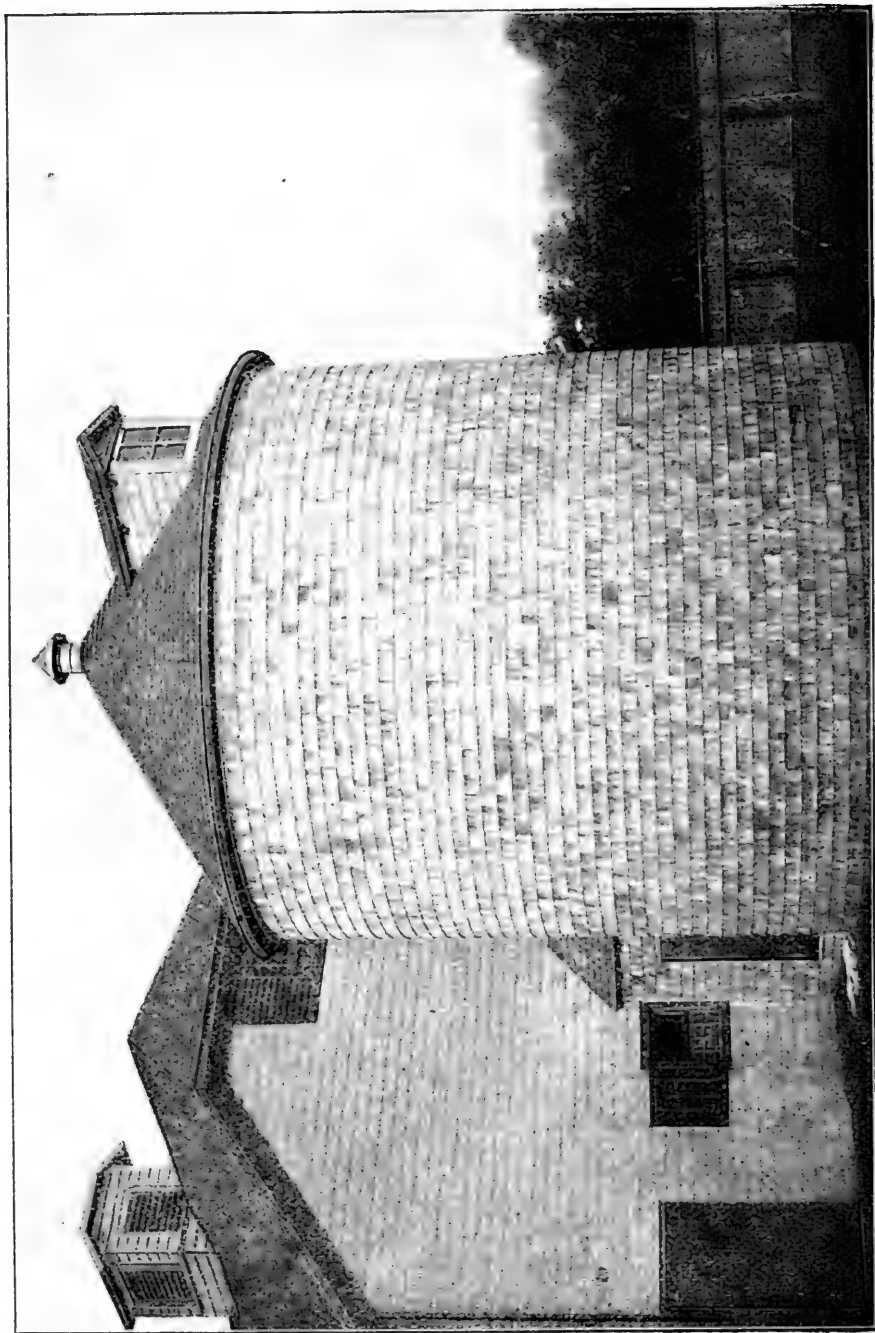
SILO AT NEW JERSEY EXPERIMENT STATION.
